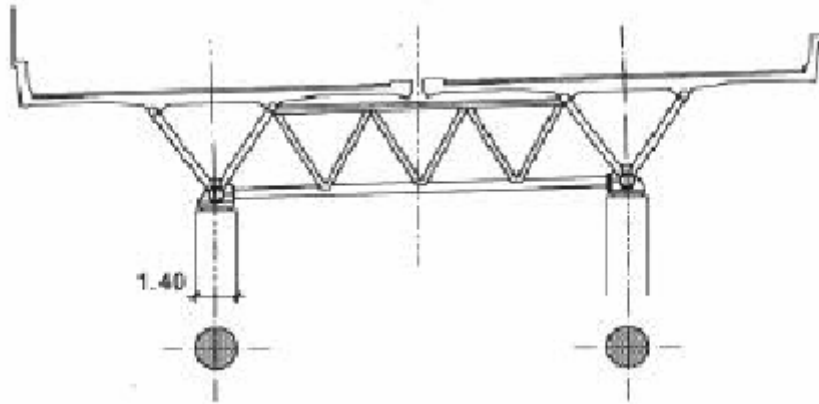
Lully Viaduct Steel Space Truss Cross-Section @ Pier
